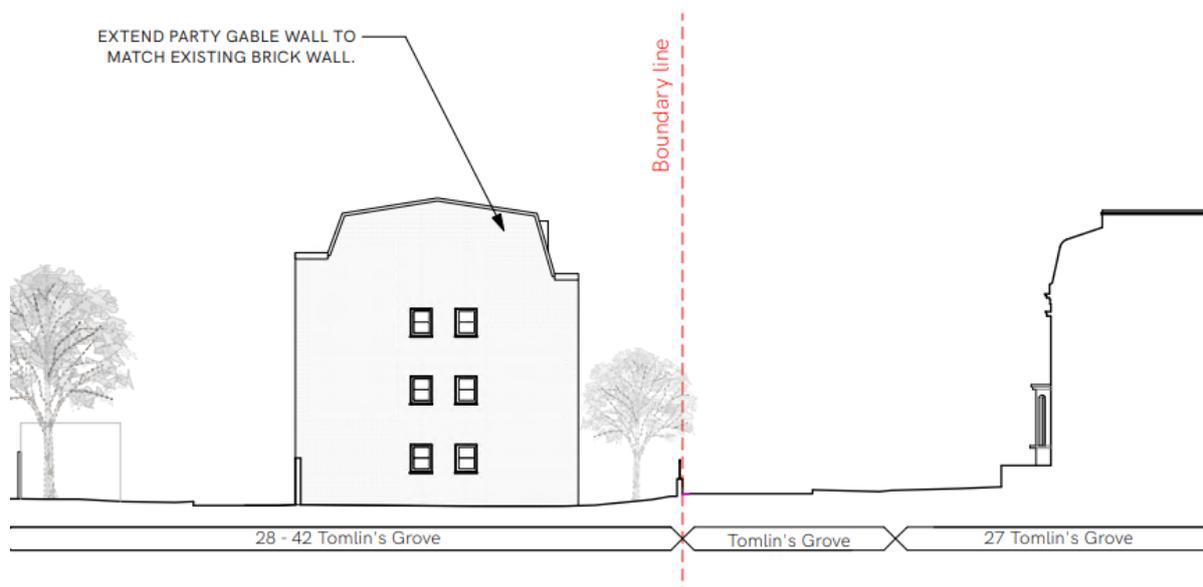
Proposed north elevation showing the relationship with the adjacent terrace on Tomlins Grove
